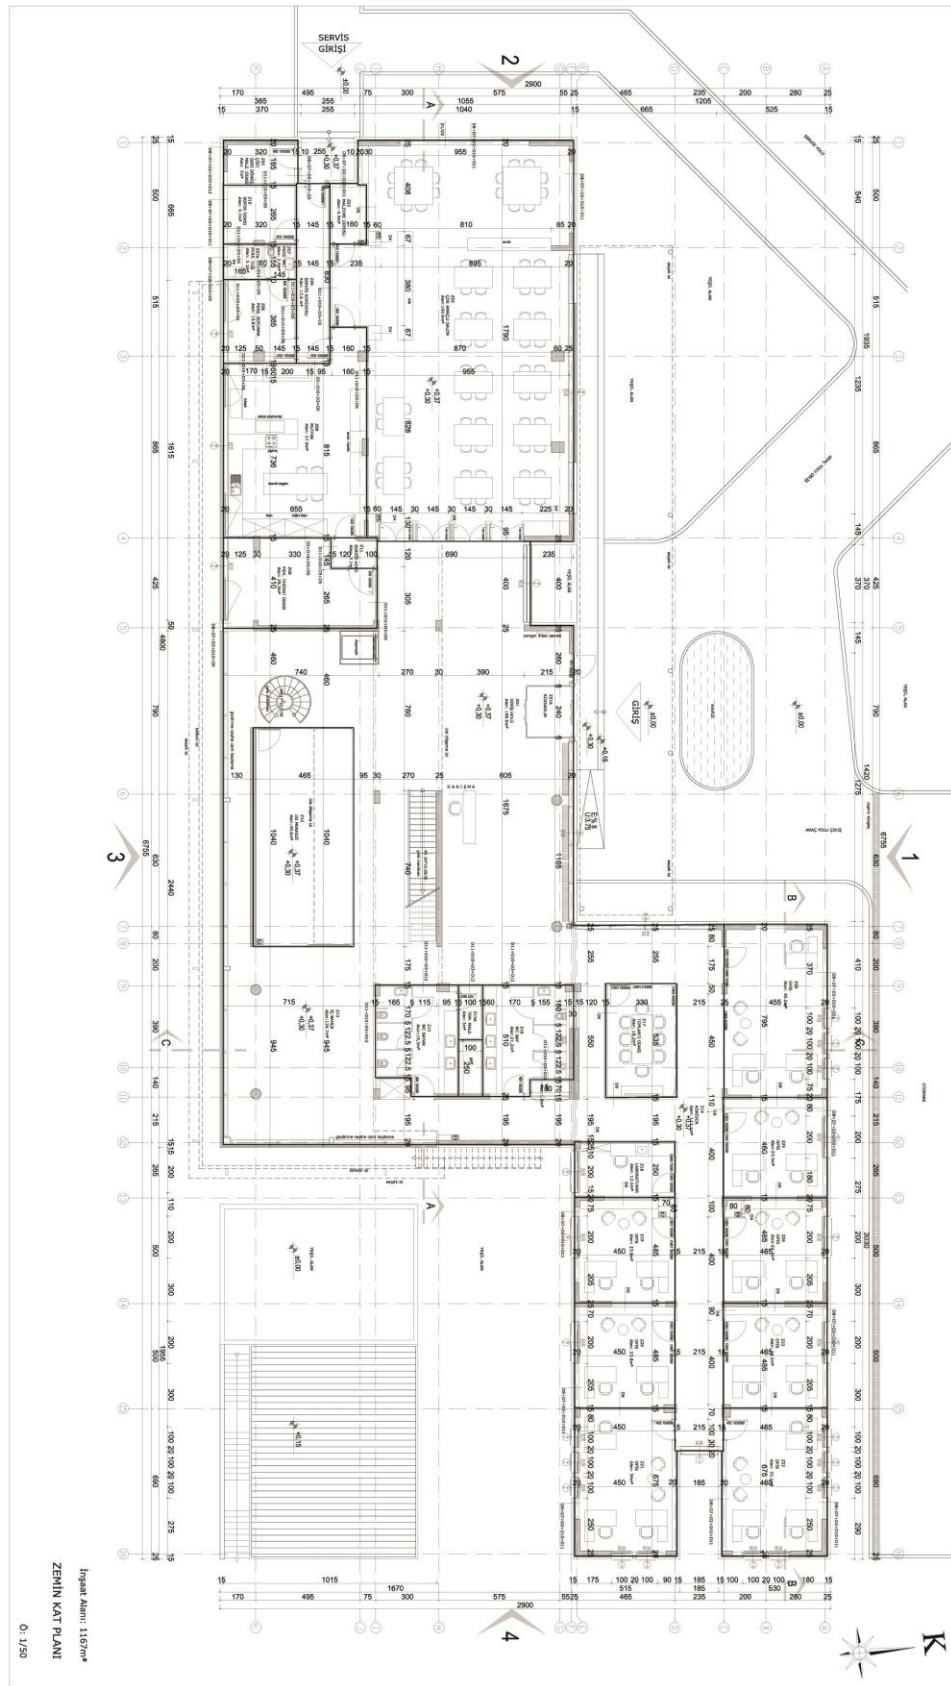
2: Case study A Ground Floor Plan
